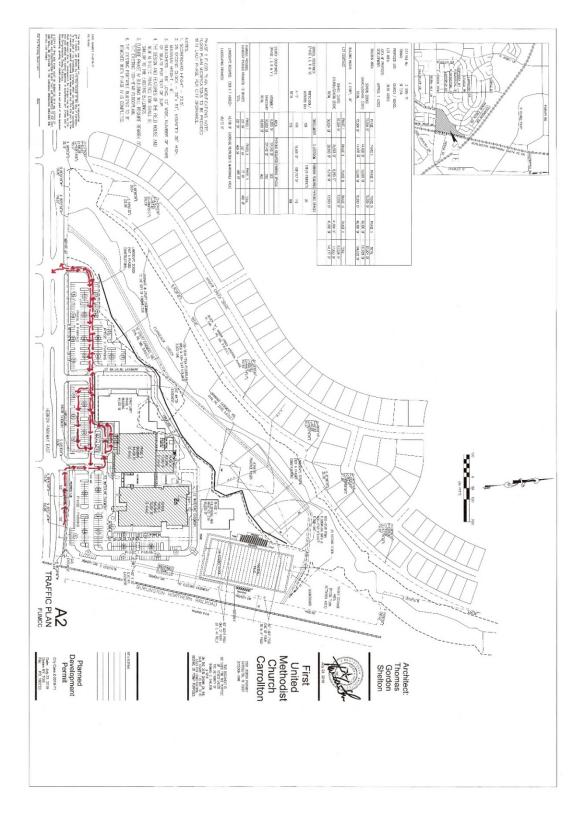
Exhibit F Traffic Circulation Plan (Elementary/Secondary School)
